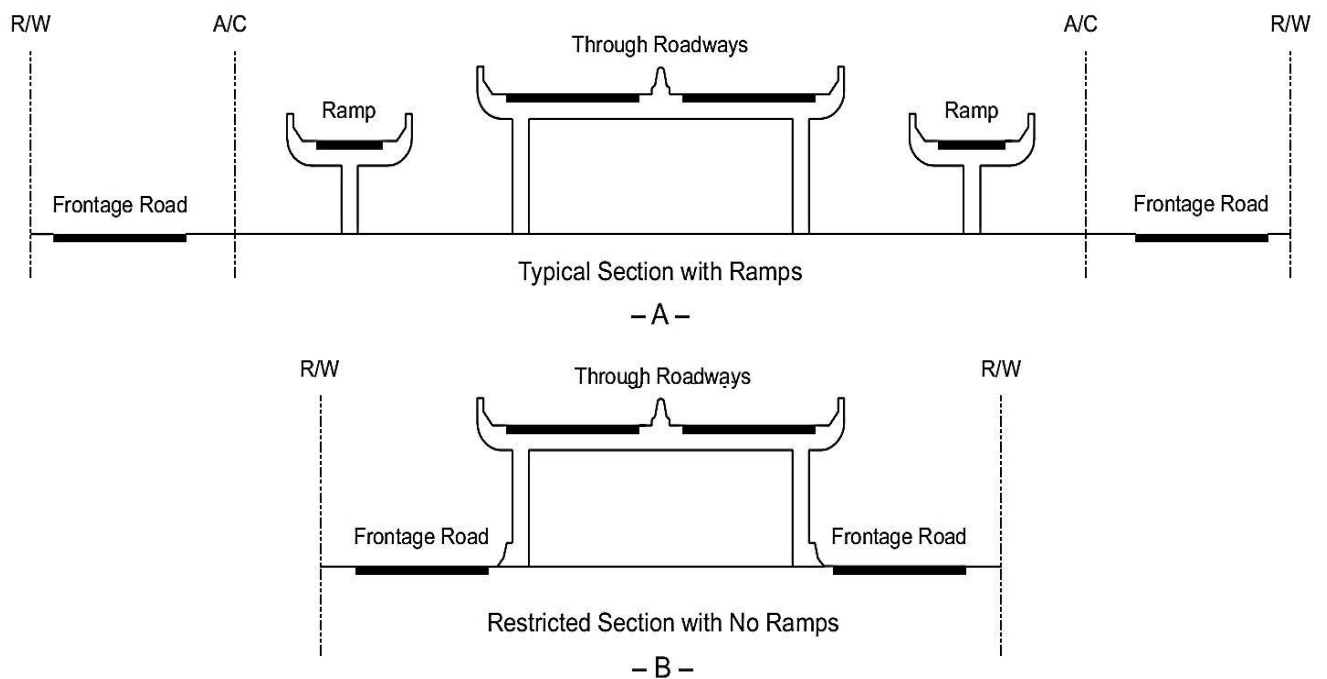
/5: Typical and Restricted Cross Sections for Elevated Freeways on Structures with Frontage Roads [1, p.8-19]
